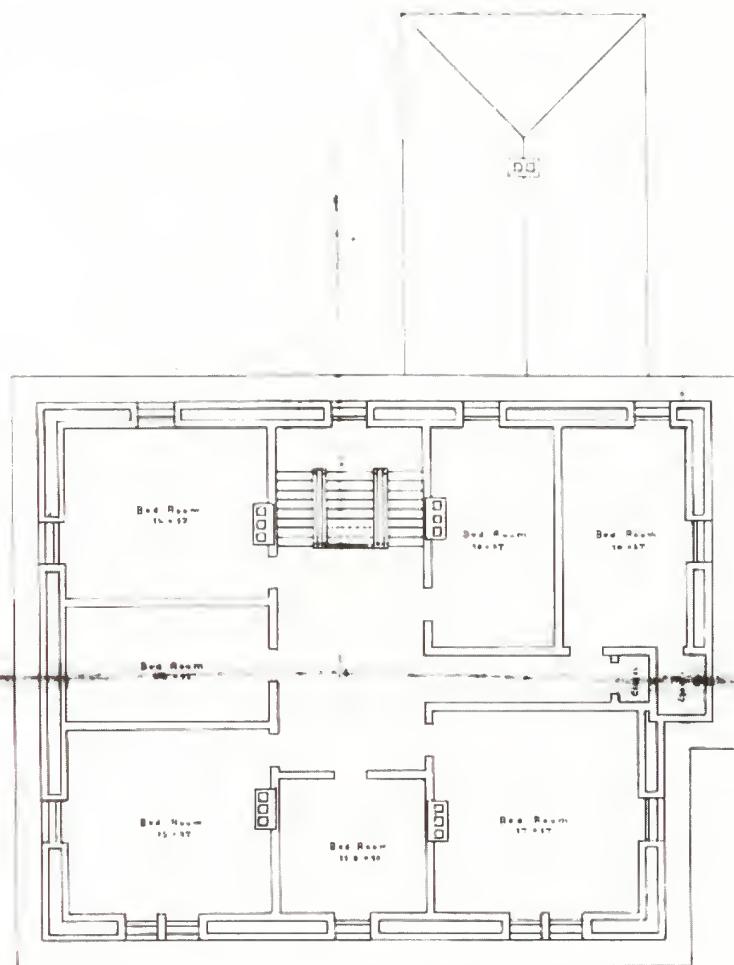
“Officers’ Quarters,” proposed second- story plan, July 1878.
